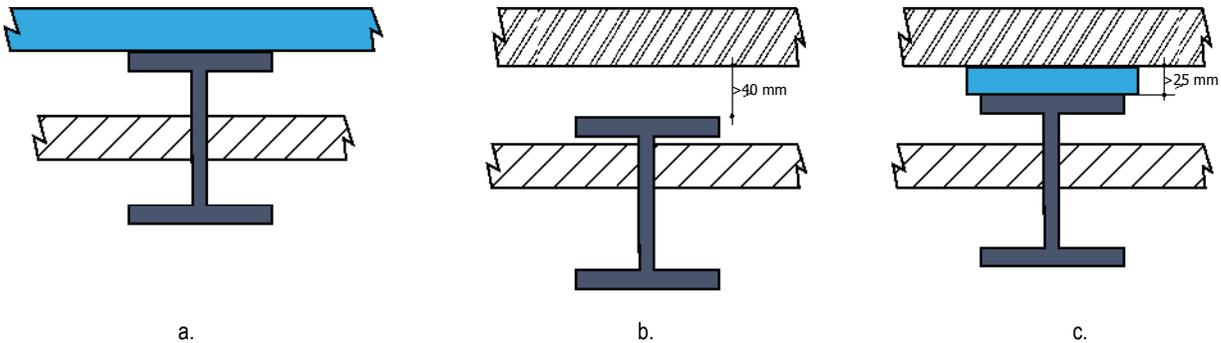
the steel structure is protected against water from the outside (horizontal cross-section)
